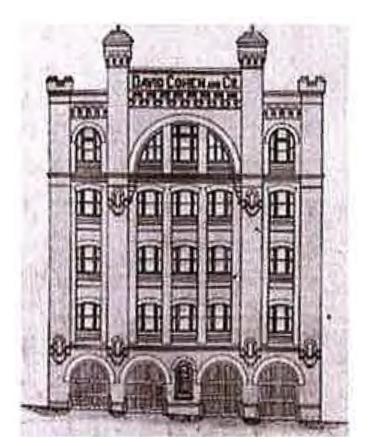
Original drawing of the David Cohen Warehouse Street Elevation.
